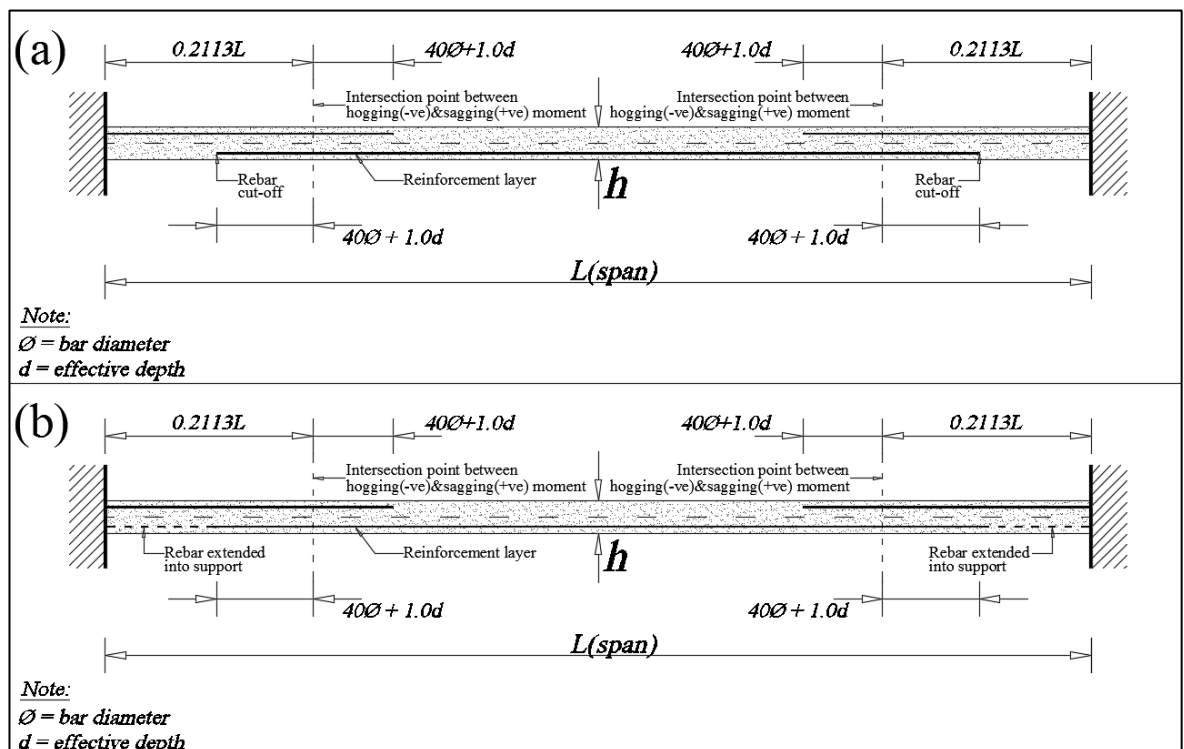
Slab's drawing showing arrangement of reinforcements
